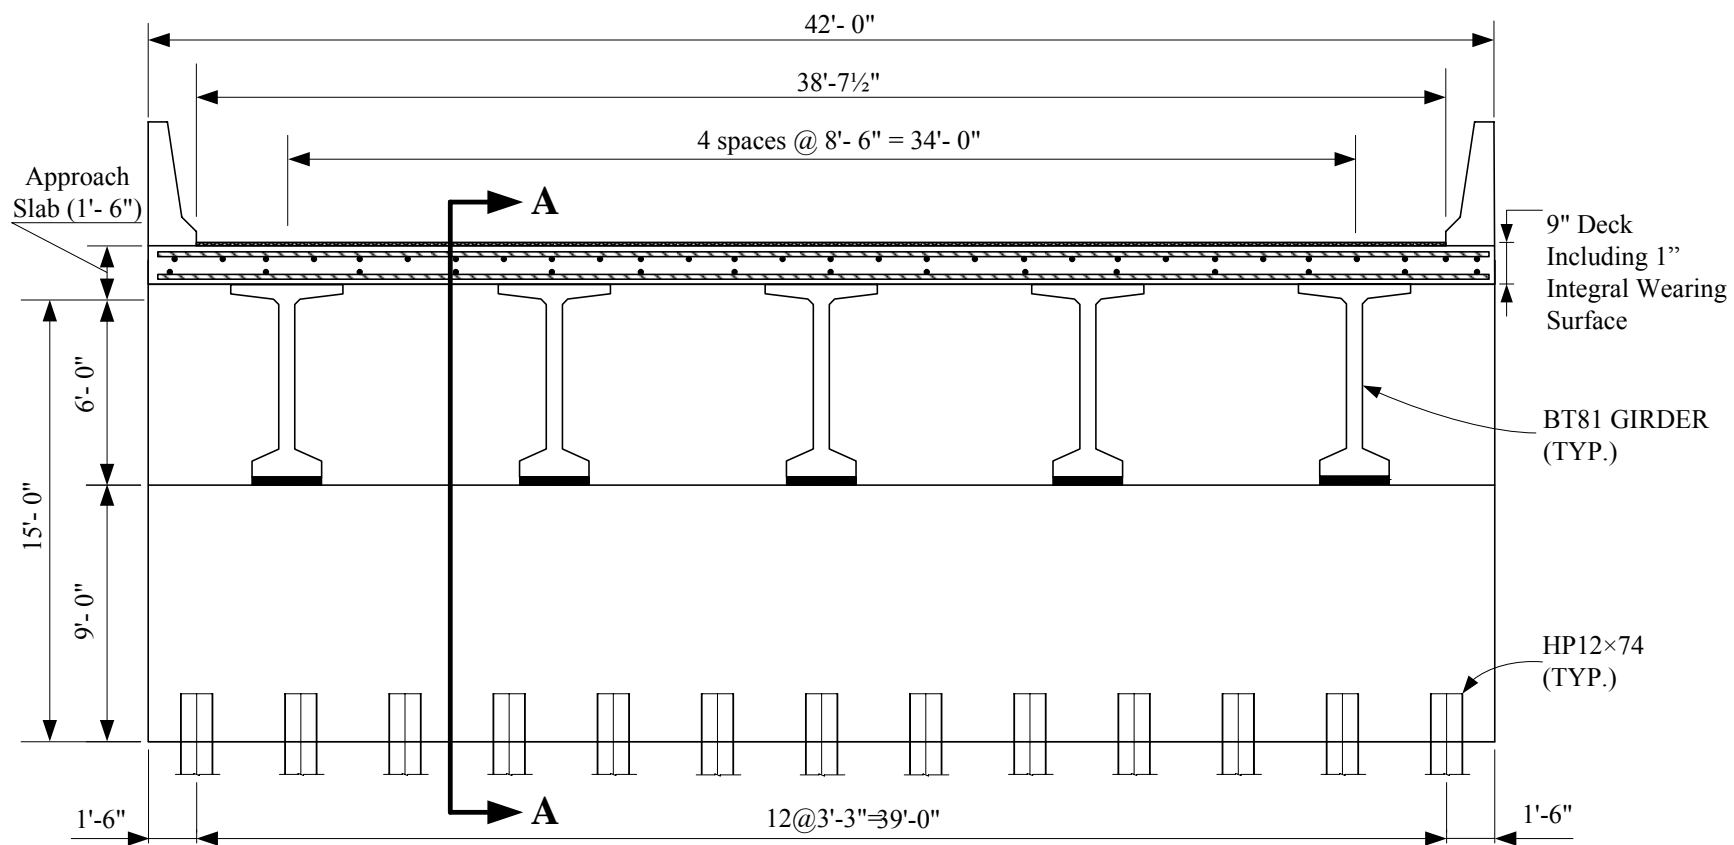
Example 3 Bridge Cross-Section and Abutment Elevation
